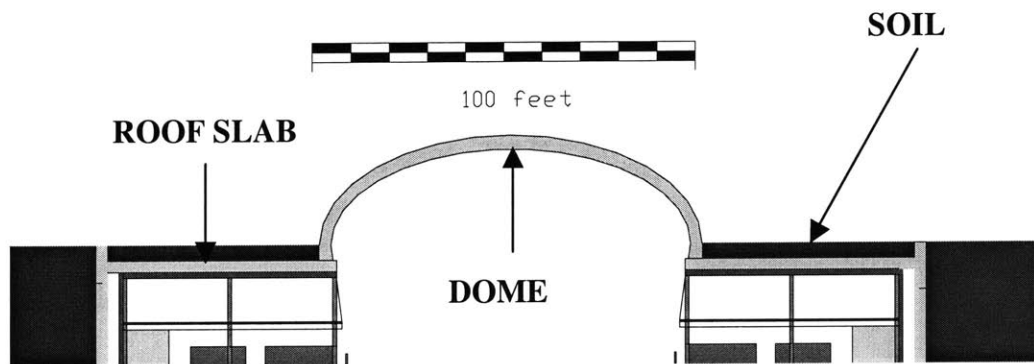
Roof Slab with 5 foot Cover of Backfill
